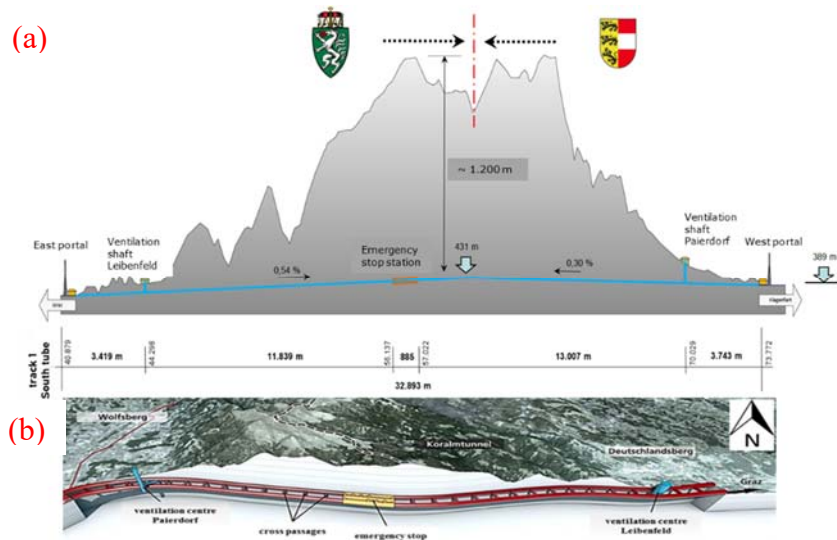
KAT tunnel system - (a) longitudinal section, (b) general scheme [16].
